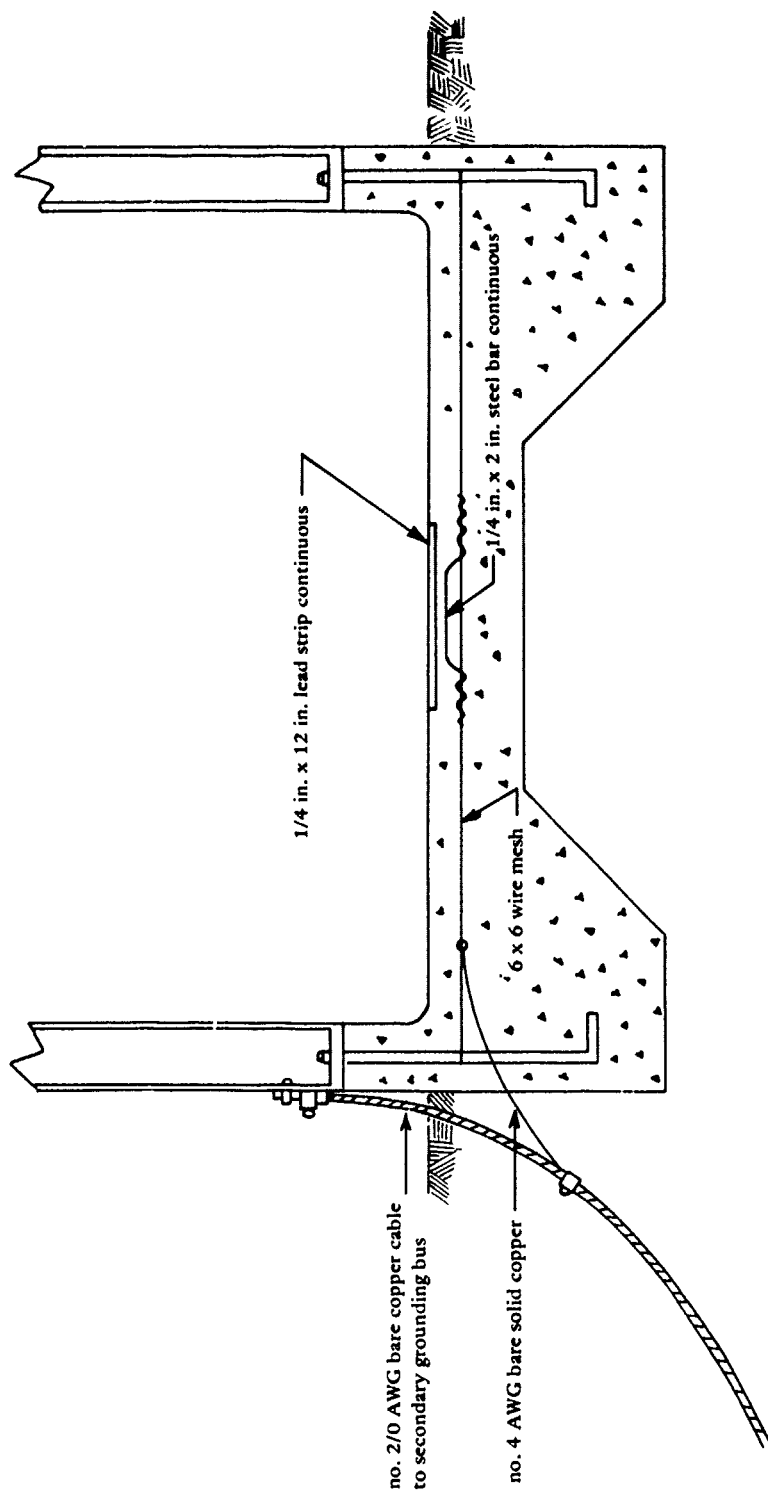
Cross section of grounded, lead-surfaced walkway interconnecting sensitive material buildings at NAD, Crane.
